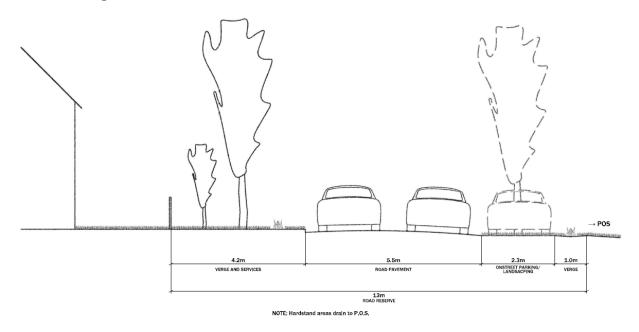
Cross section for typical road reserve for access streets facing POS
